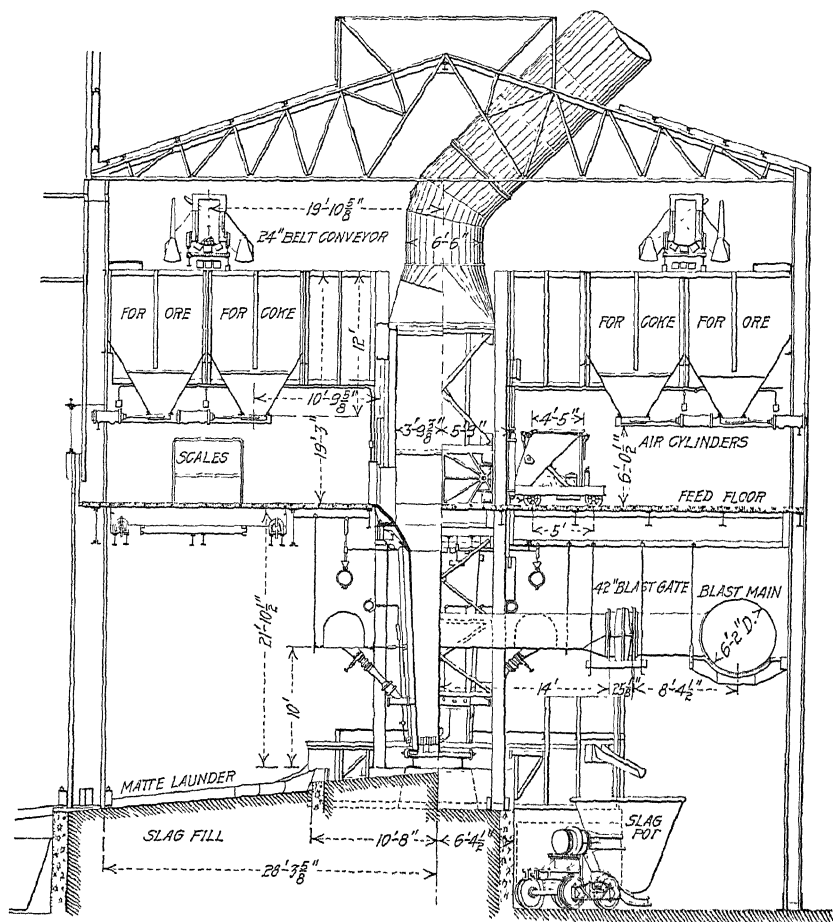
END ELEVATION OF BLAST-FURNACE PLANT, CALUMET & ARIZONA MINING CO., DOUGLAS.
